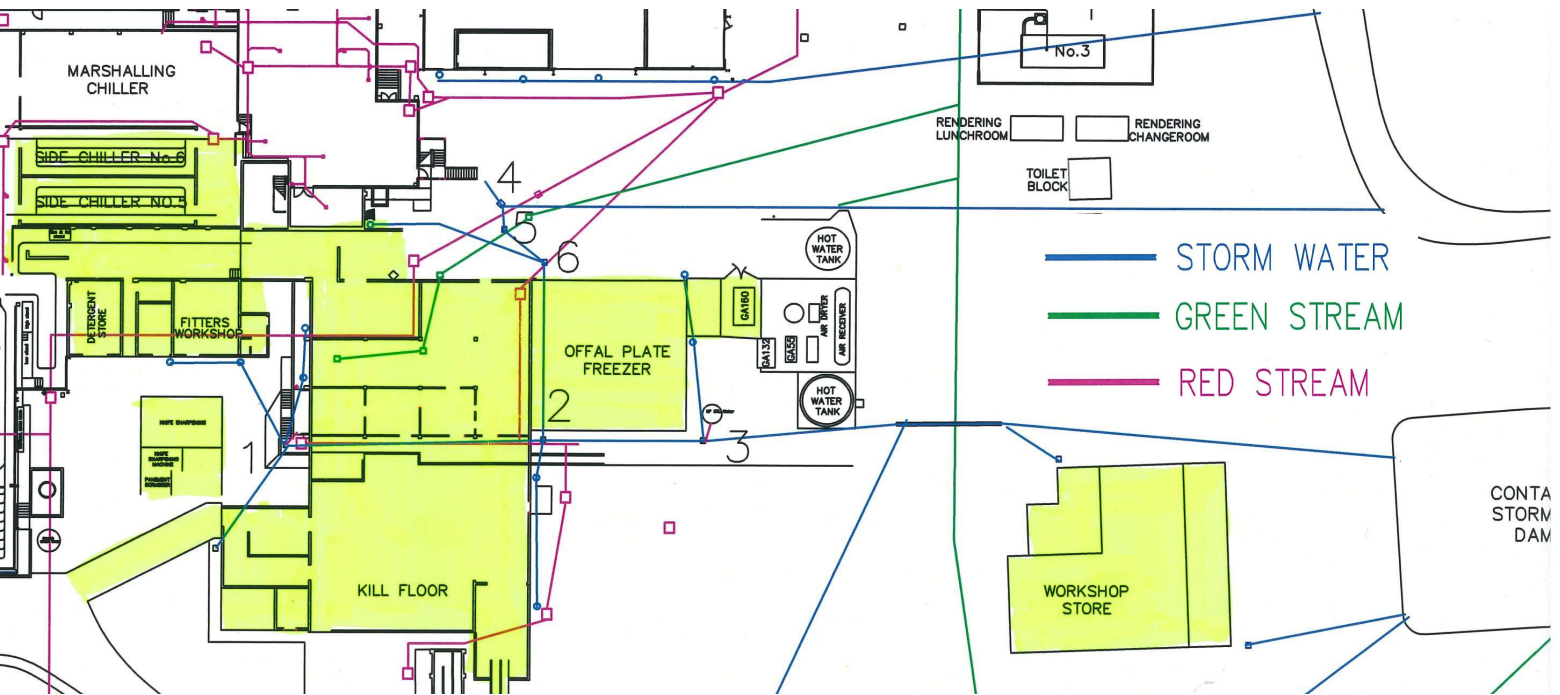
Dye Tracing Map including drain numbers and highlighted roof areas identifying roofed stormwater draining to contaminated stormwater pond
